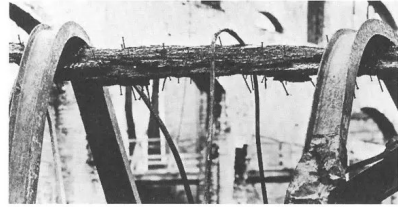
After fire scene. Shows a wood beam supporting twisted steel I-beams. (Forest Products Laboratory)
